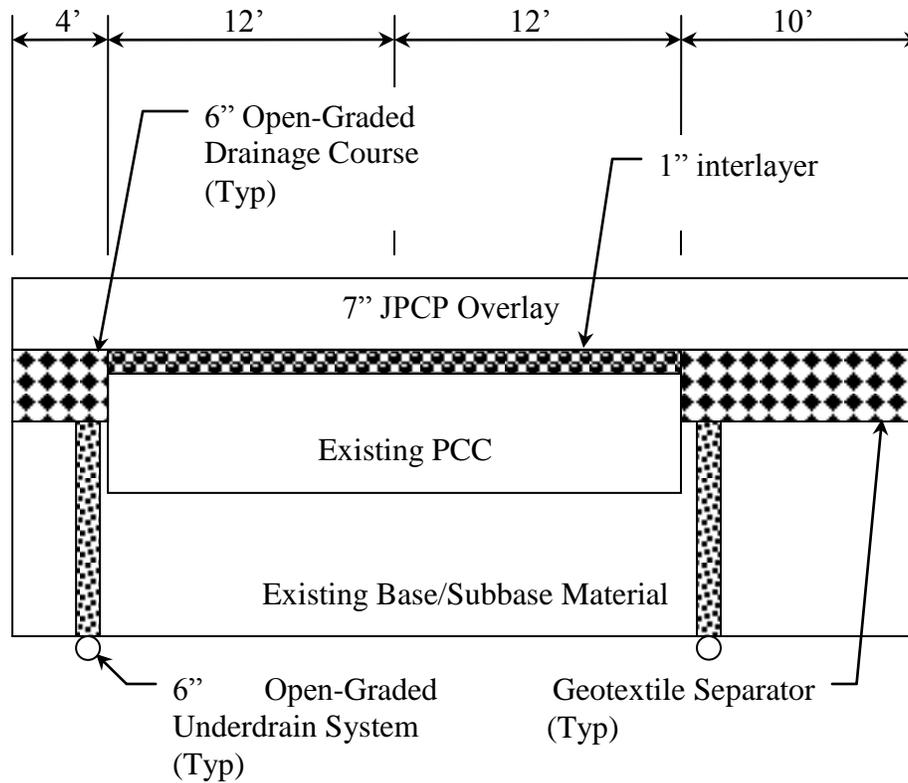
New Overlay Drainage System: OGDC Shoulder Design
